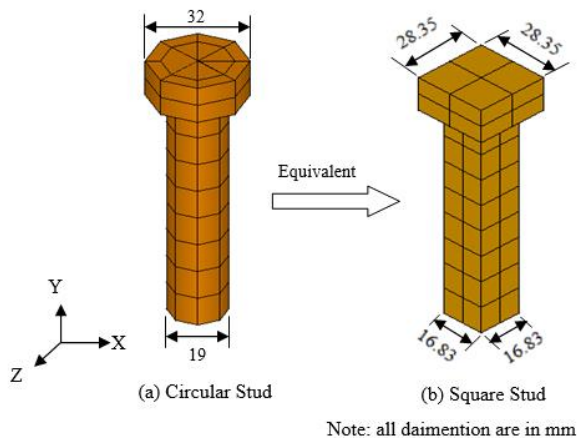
Dimensions of circular and equivalent square-headed shear connector
